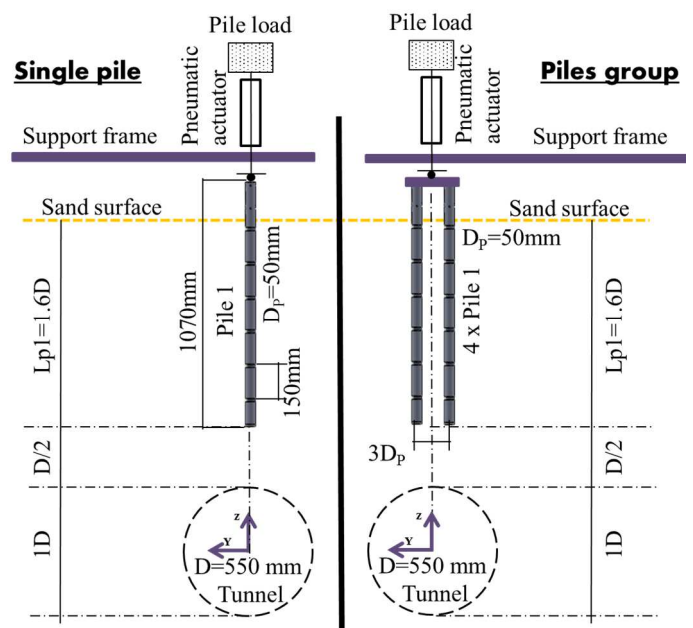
Geometric configurations of the tests carried out with single pile or piles group.
